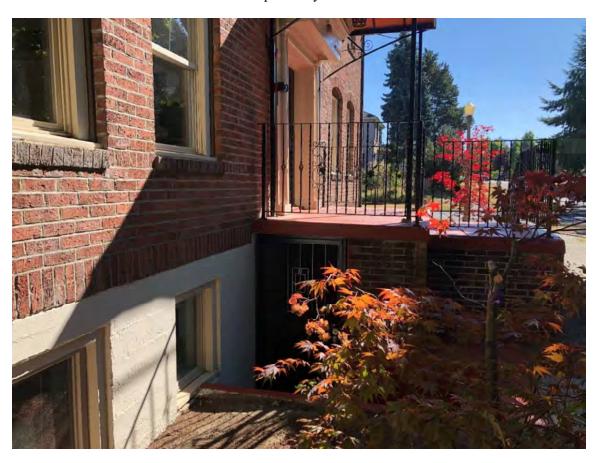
(After). Newton Apartments, north façade, egress from Basement (below front porch), looking south. August 2020. Source: Stephen Day Architecture.
